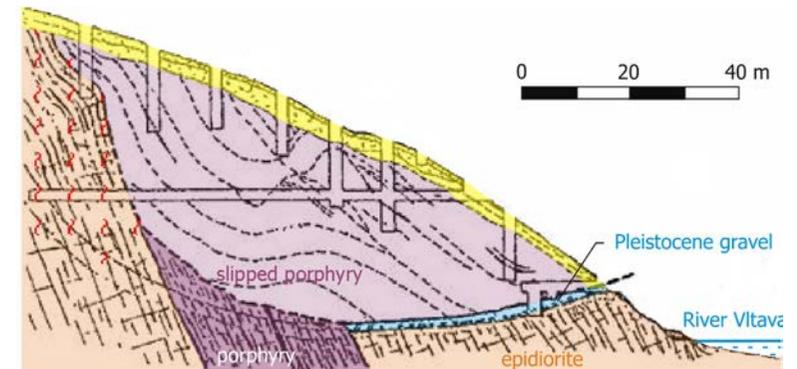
Cross section along the profile originally chosen for the Orlik dam showing the rotational slope failure above the Vltava and the exploratory workings excavated in the mass of slipped porphyry
